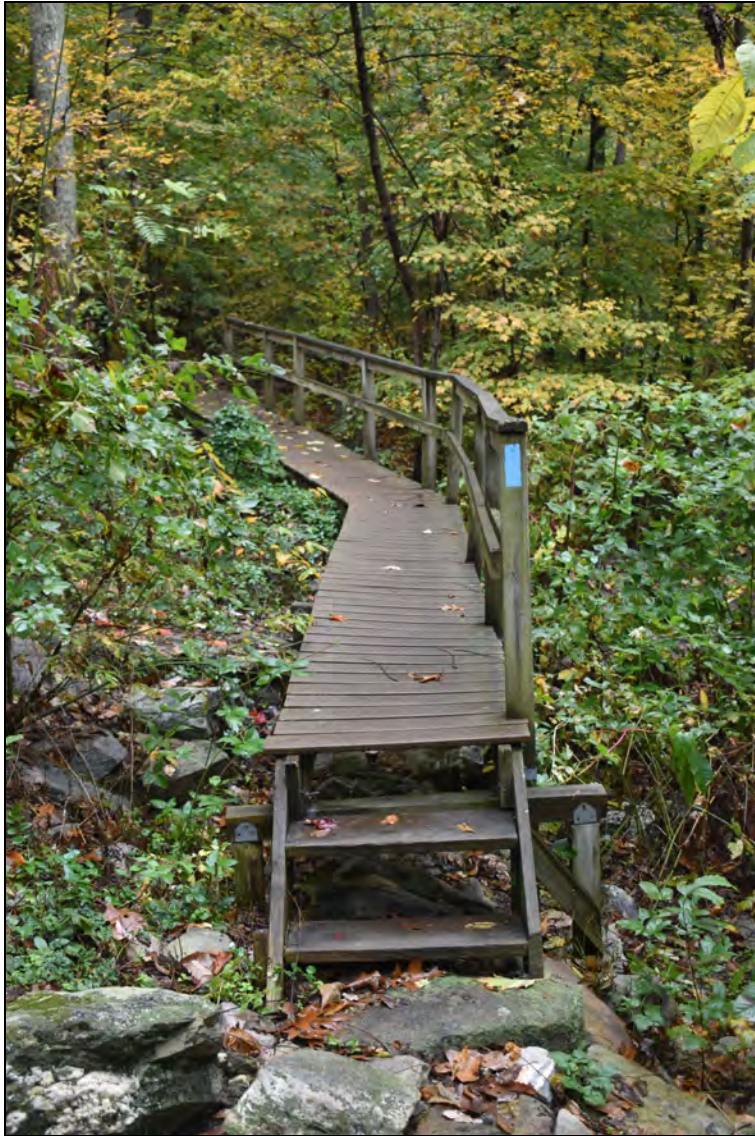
of 45. Crampton Gap OUA Side Trail Bridge (Section 5), facing north.
